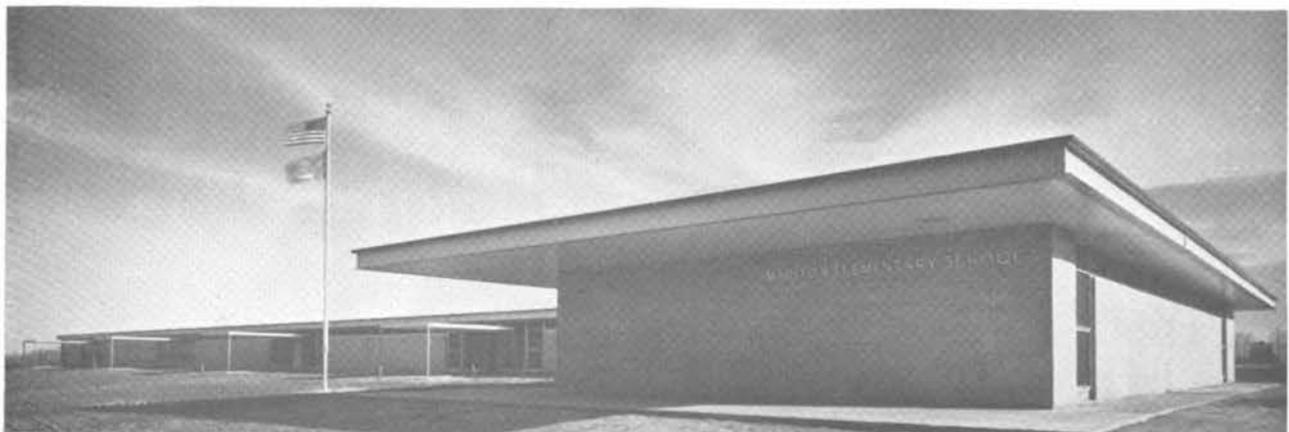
Use of high brick walls on north and west with small glass area for light distribution, Madison Elementary School, Norman, Okla.
